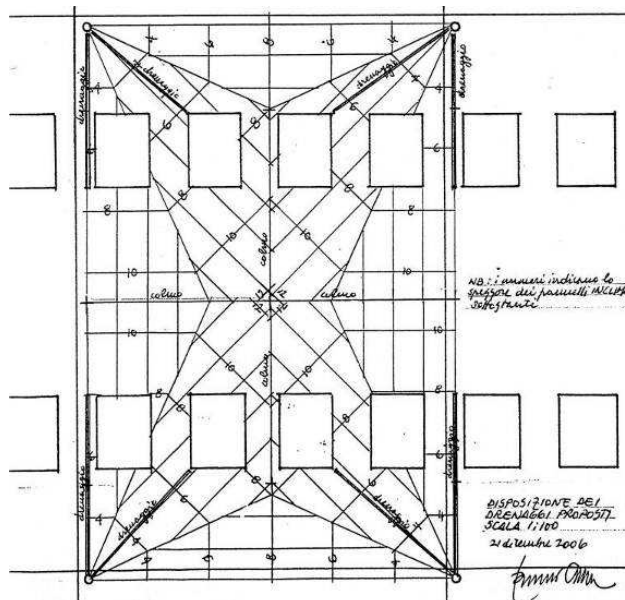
Plan of a typical span of the industrial plant, with drainage grooves added during the work
